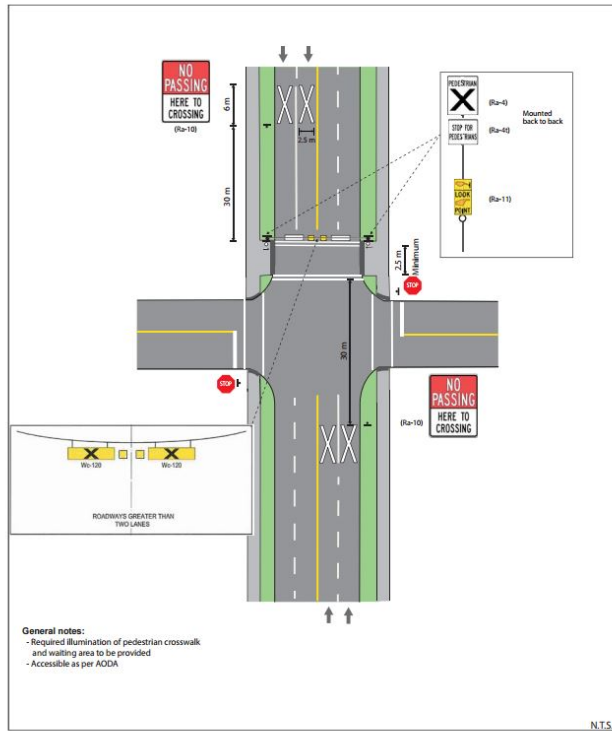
Pedestrian Crossover Level 1 Type A – Intersection (2-way)
